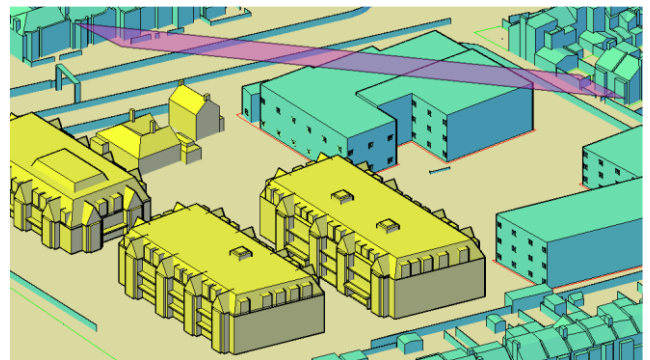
25-degree plane from assessed windows at 2-26 Buxton Road
